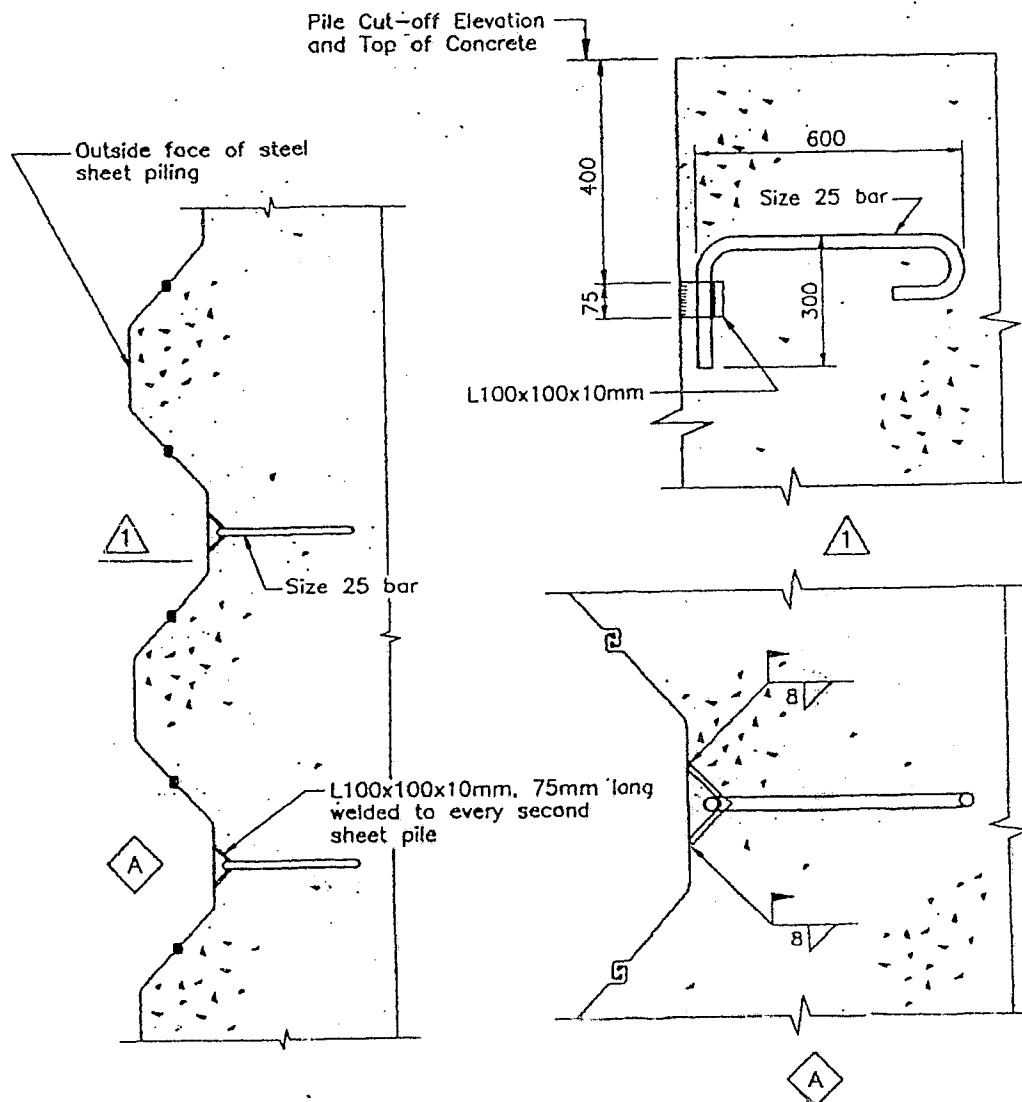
Sheet pile anchor detail [Ontario Provincial Standard Drawing]
